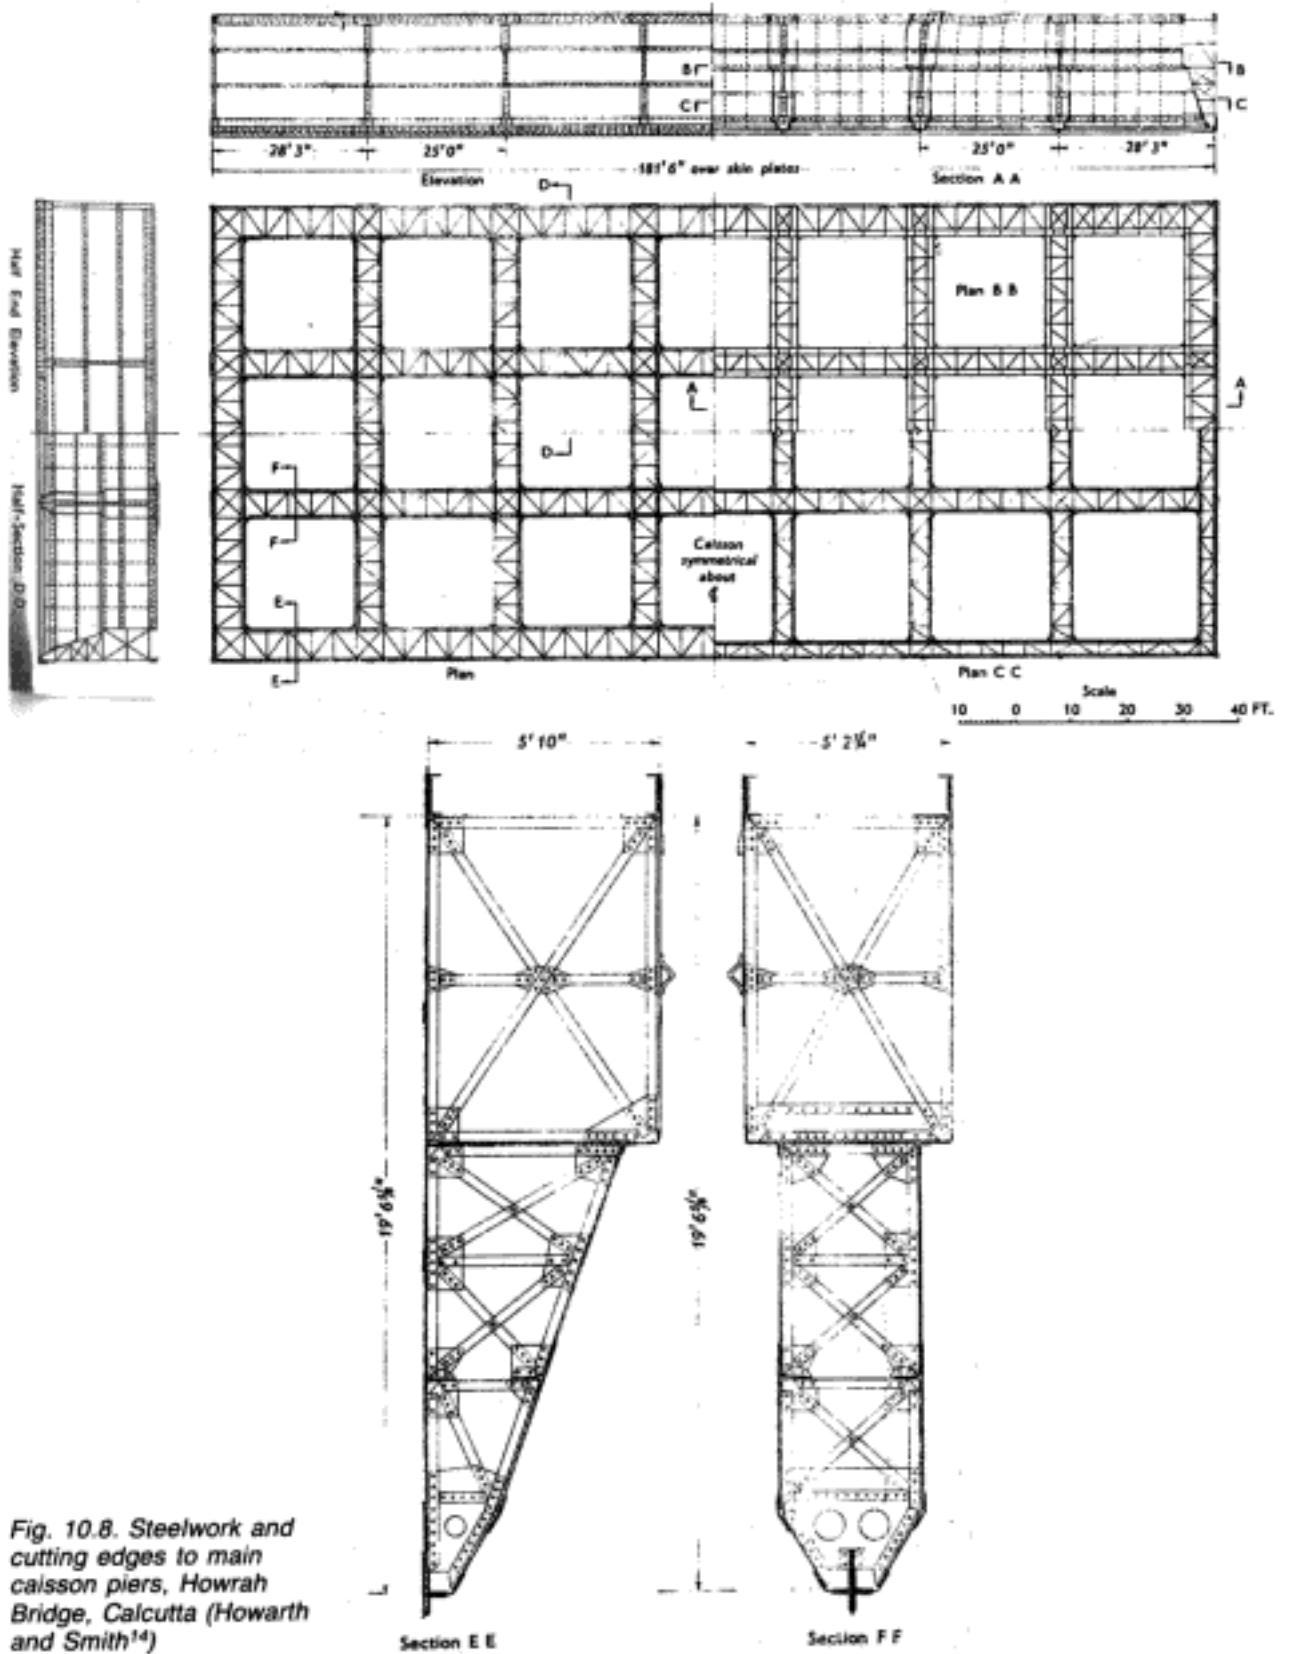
Steelwork and cutting edges to main caisson piers, Howrah Bridge, Calcutta (Howarth and Smith¹⁴)
